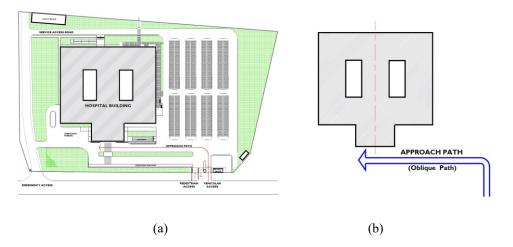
The approach system adopted in the proposed design (a) site plan, (b) pattern of the Oblique-styled approach path
